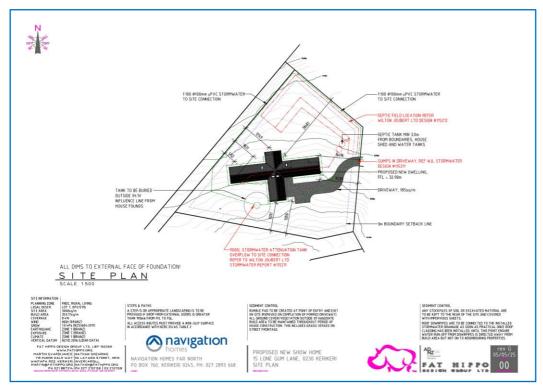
Site Plan (Source: Fat Hippo Design Group)
